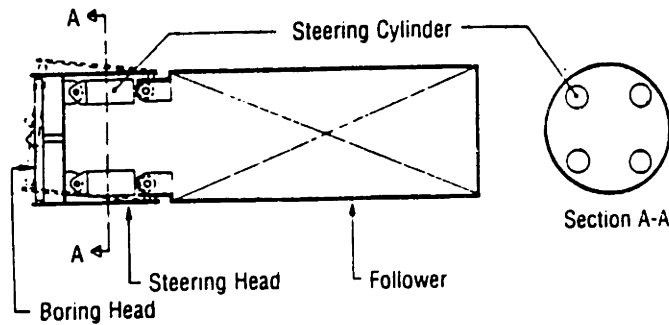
View of steering cylinders used for moving the steering head of shield tunnelling machine (Stein et al., 1989)
